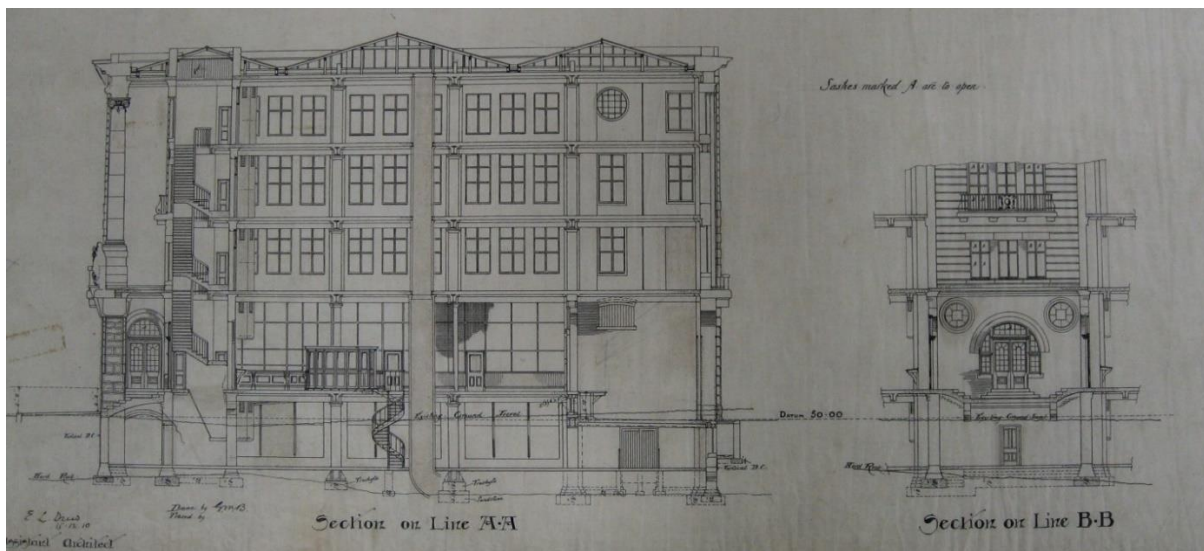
Detail from Sheet 5, Section on Lines A-a and B-B: New Parcels Post Office Premises at the Central Railway Station Sydney, 1910 (showing the original four storey elevation).
